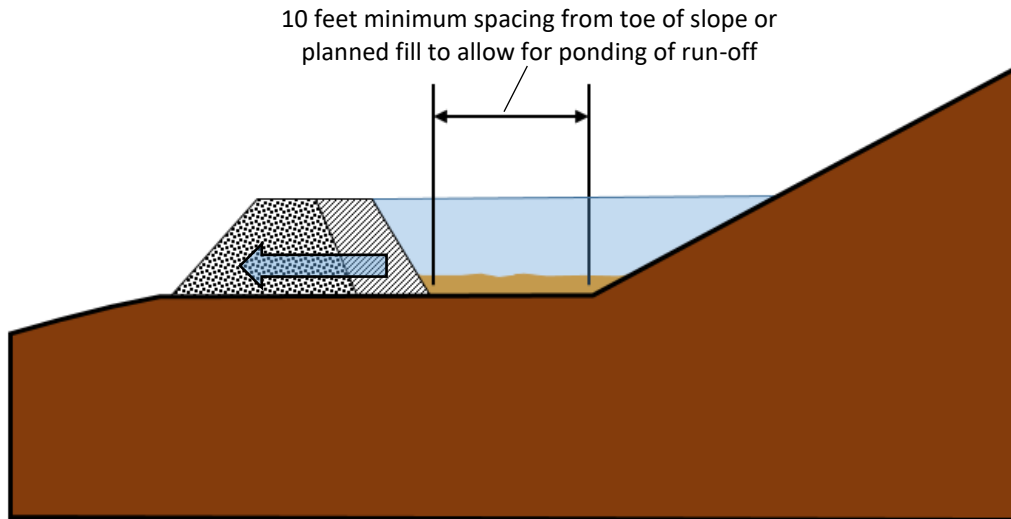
F. Rock berms have been installed along the margins of the stream channel to protect it from sediment discharges and as a barrier to construction impacts. Leveling has been done upslope of the berm to facilitate berm installation and to provide additional pooling storage area.
